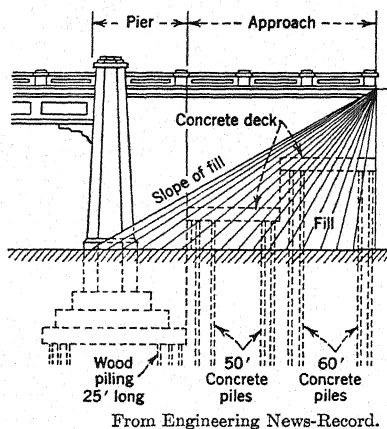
Abutment for St. Joseph River Crossing, Grand Trunk & Western Railroad. (See p. 421.)
